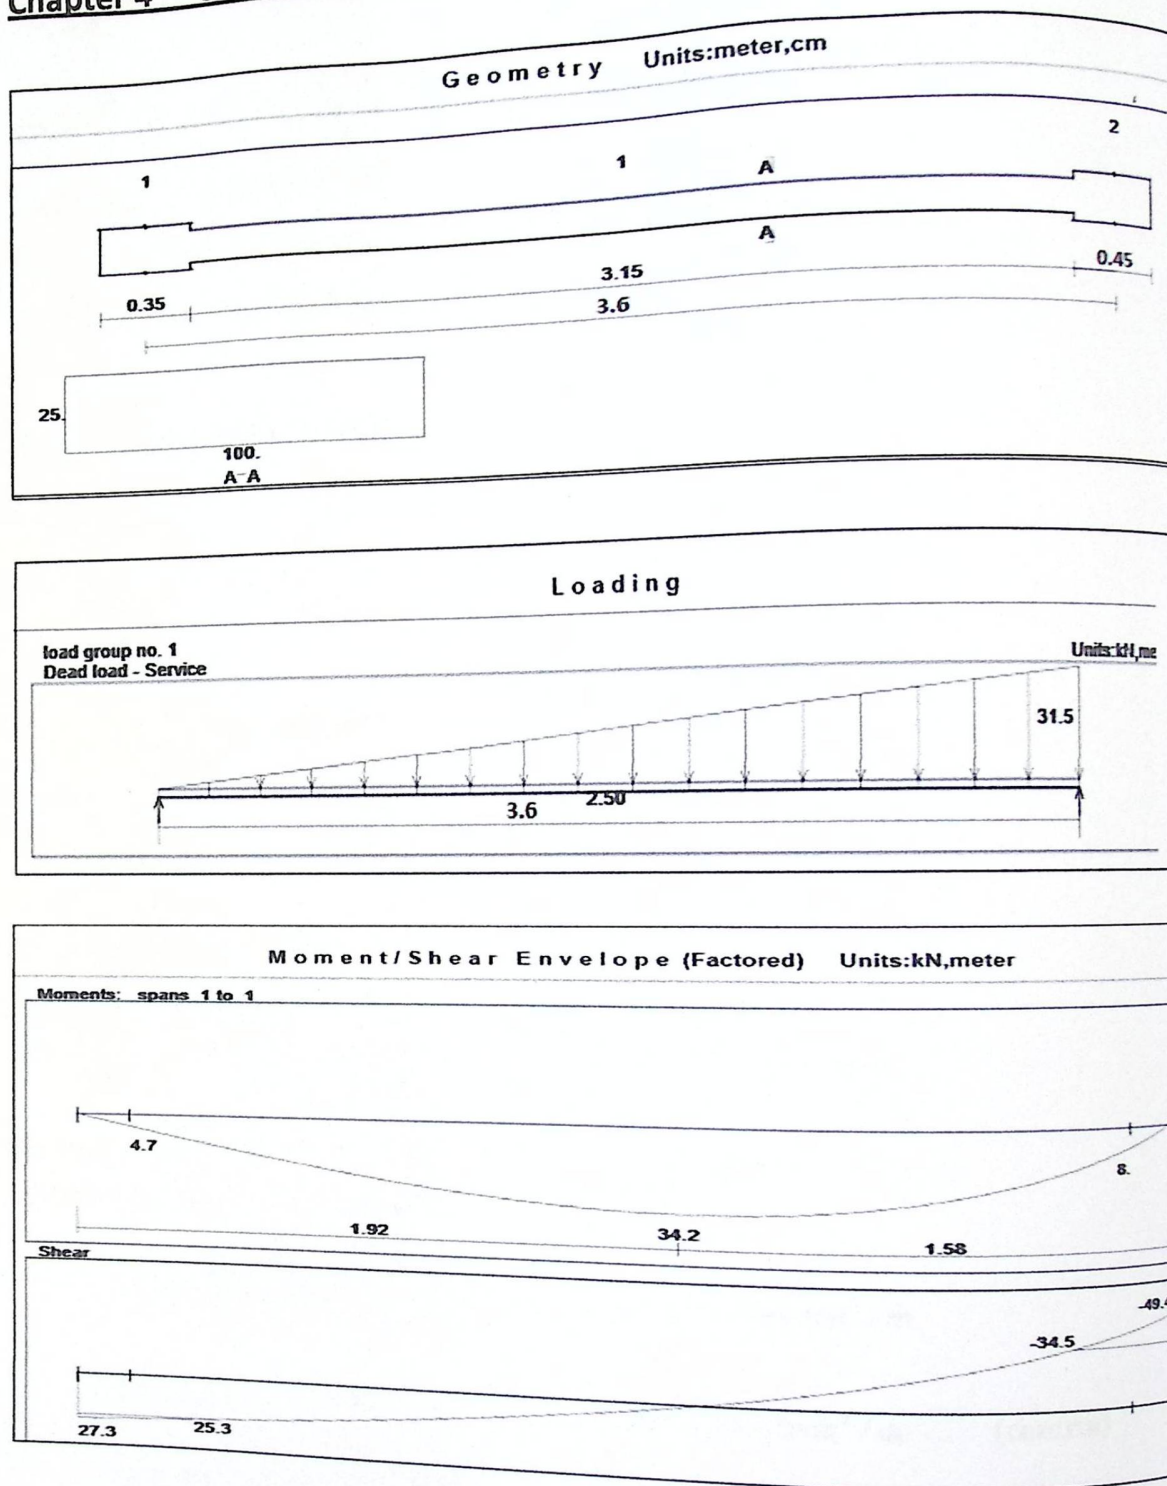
Loading and Envelope of Basement Wall (BW1)
